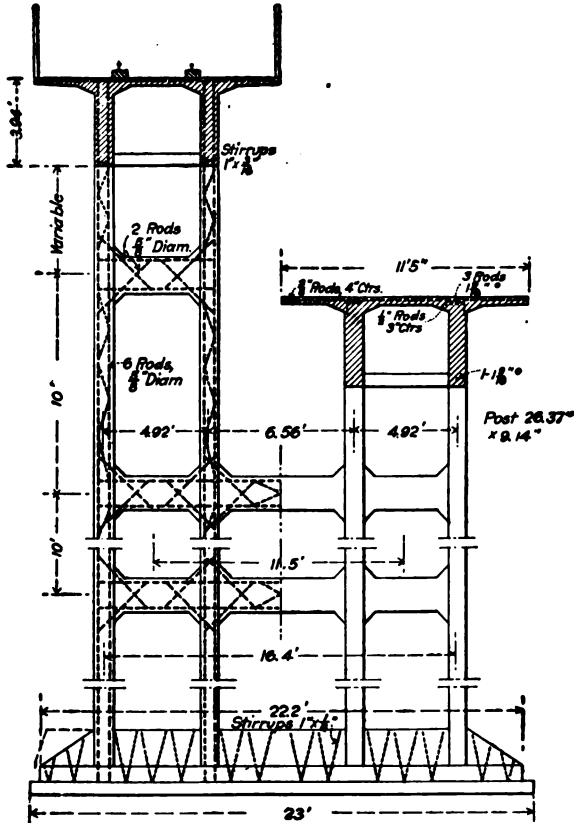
Transverse Section, Guadalquivir River Viaduct.
